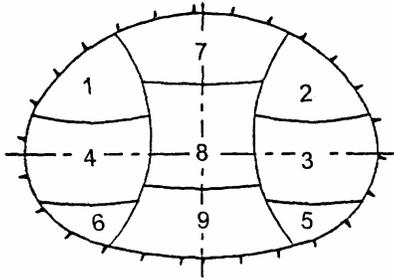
Twin side drift and central pillar excavation method. Temporary support consists of double wire mesh reinforced 250 - 300 mm thick shotcrete shells with embedded lattice girders or HEB 160 steel sets at 0.75 - 1 m spacing.
